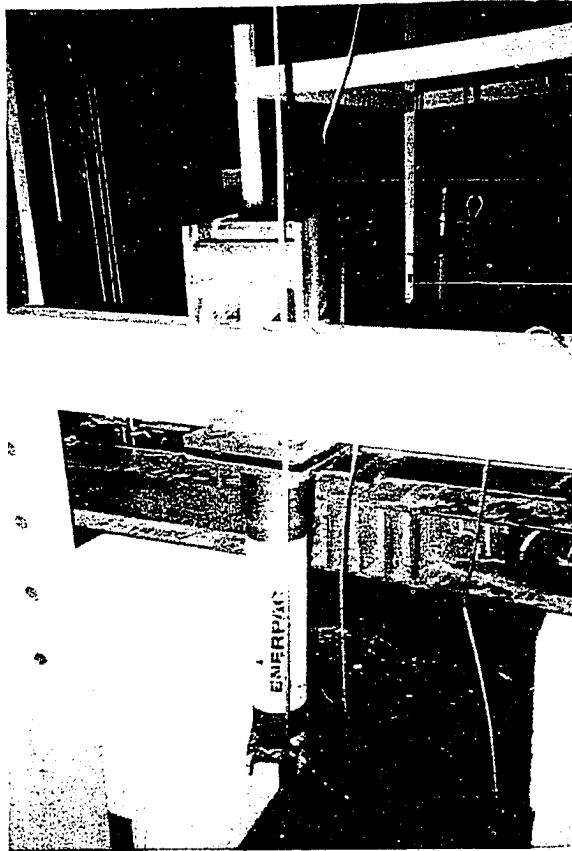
Loading jack (27) and cable arrangement for frame horizontal load application
